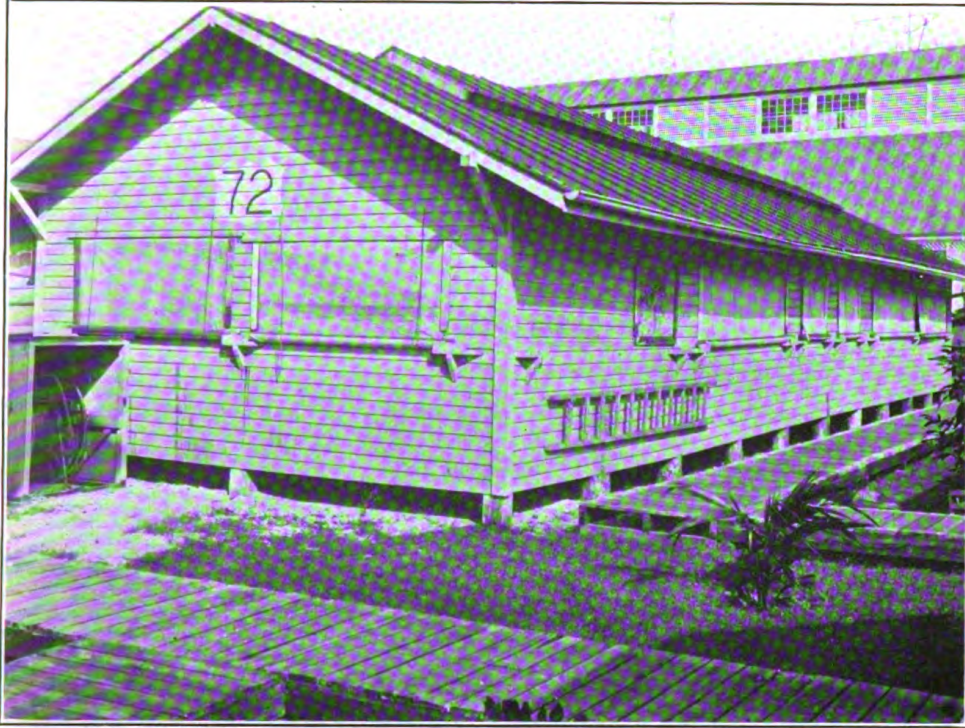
Frame barracks, with board flooring, 12 inches from ground, resting on wooden blocks; considered satisfactorily rat proof if containing no rat food supply. Board walks, which afforded favorite rat runways, were replaced with marl, as in Fig. 8. Board platforms for chemical fire extinguishers shown at left were replaced with concrete.
